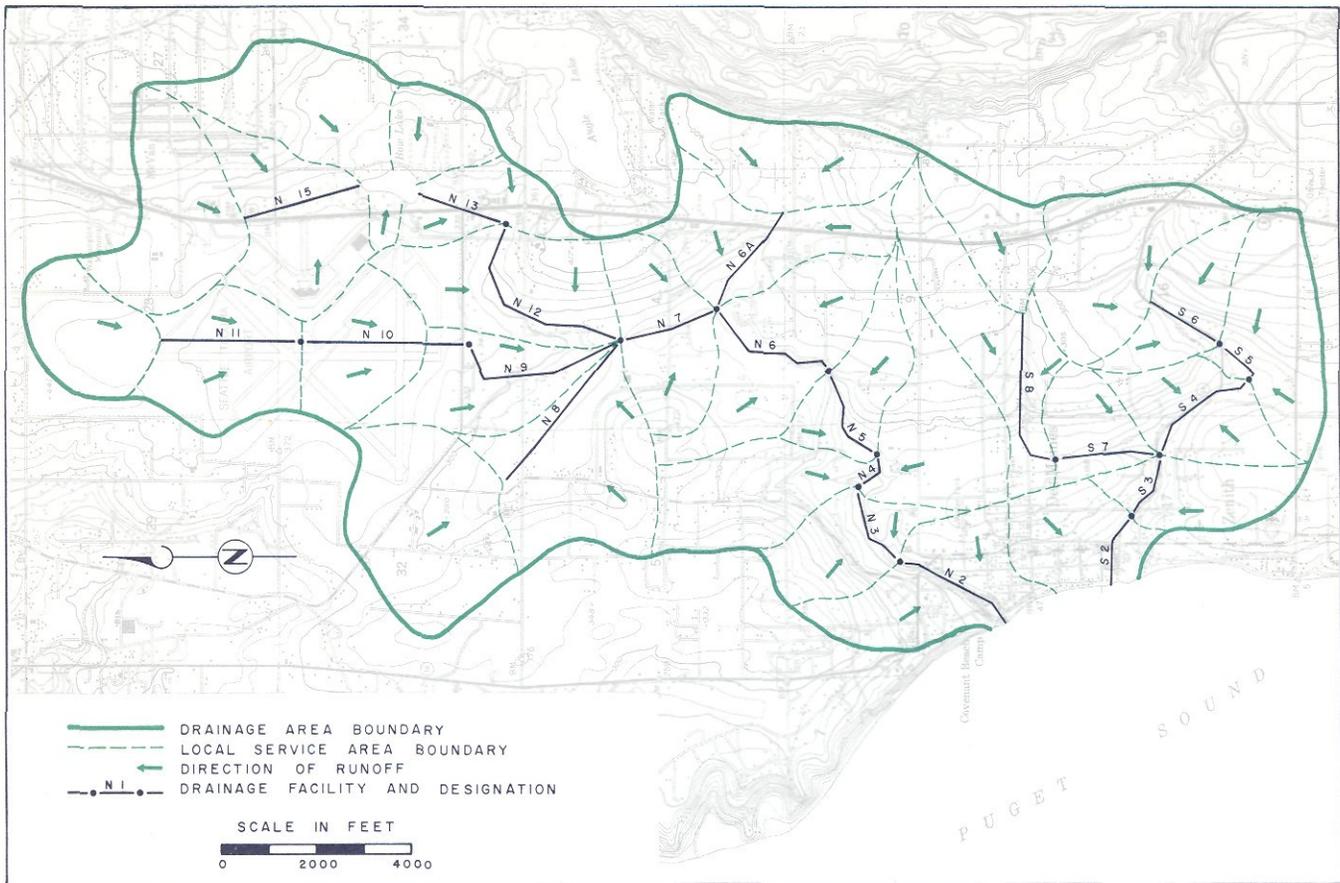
Storm Drainage Plan, Des Moines Area
